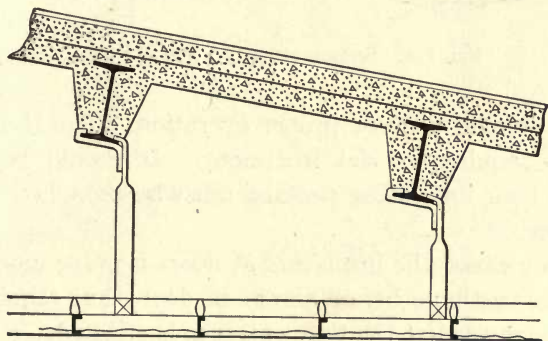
Reinforced Concrete Roof and Ceiling.
